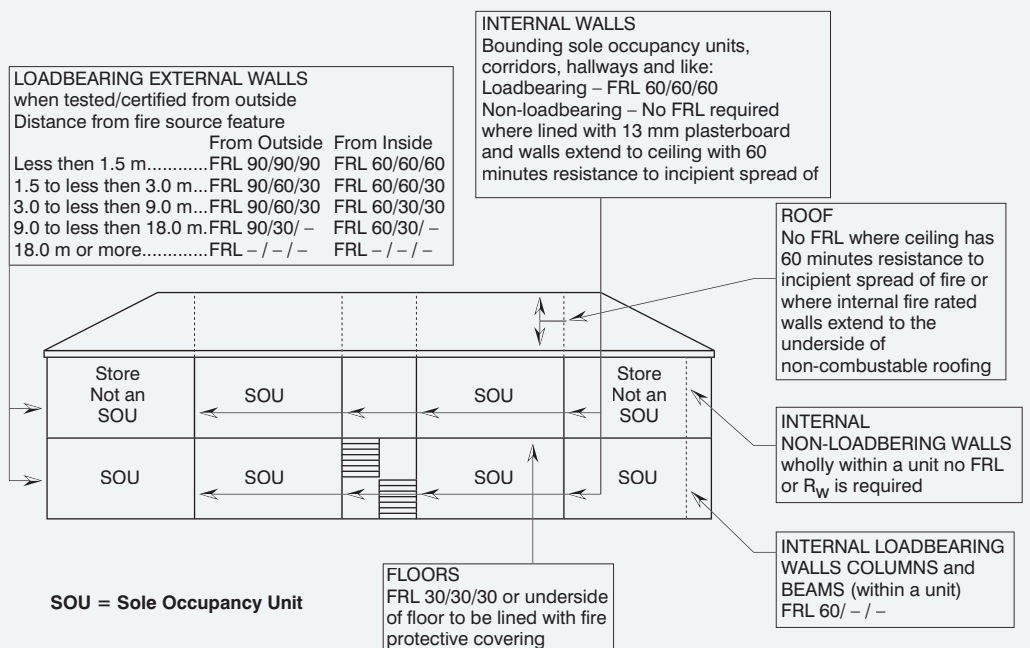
Type B Construction Deemed to Satisfy Requirements – with sprinklers and smoke alarms.
